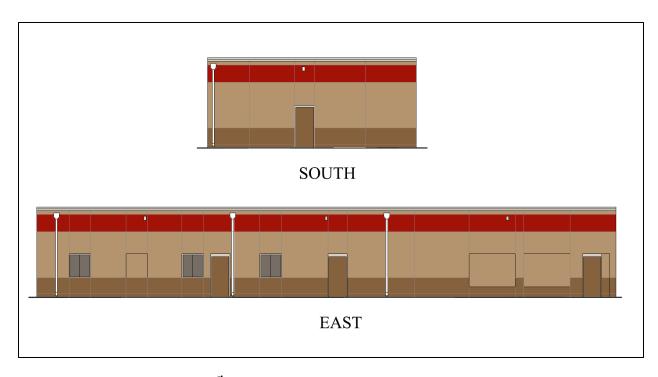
1<sup>st</sup> Submission: Proposed South and East Elevation.
